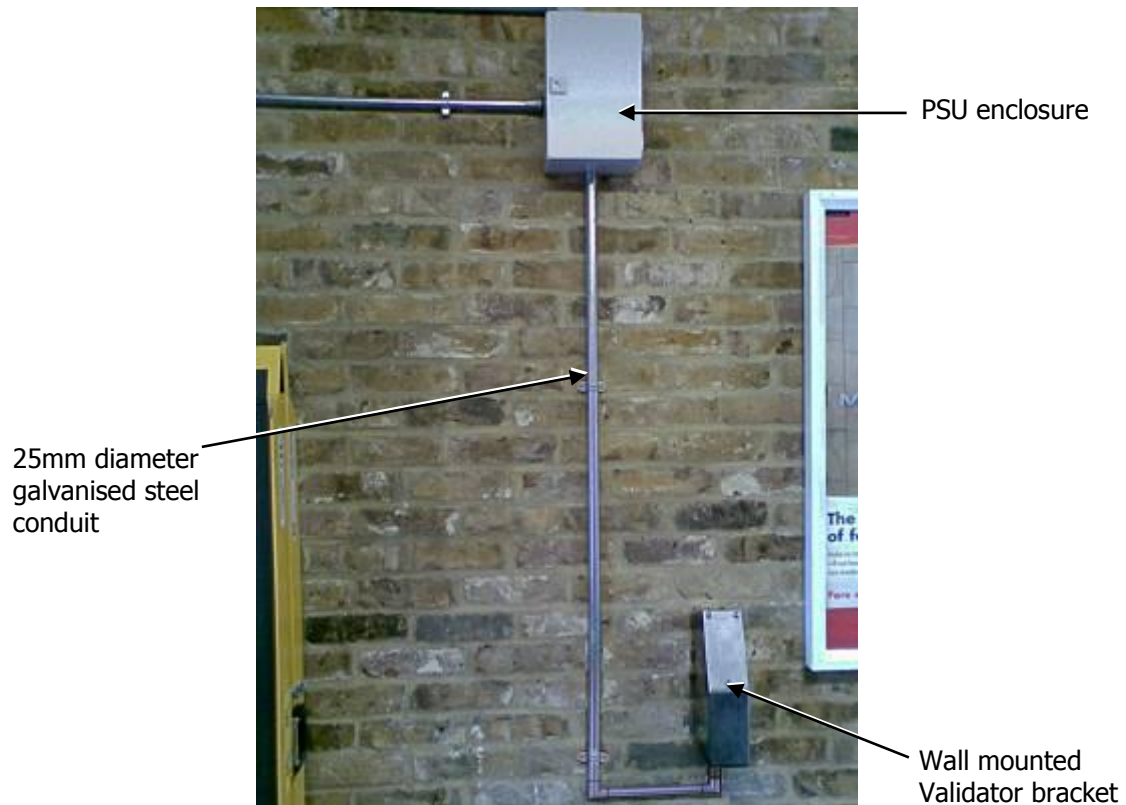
Typical Client enclosure and wall mounted bracket awaiting Validator installation
